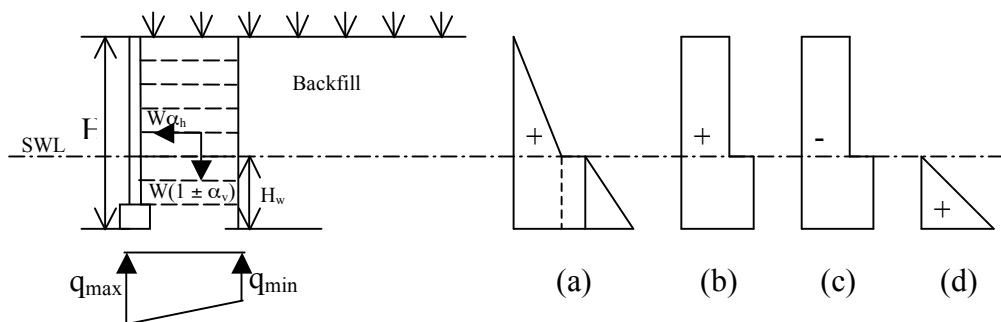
Section of reinforced earth wall (a) Earth pressure due to backfill soil (b) Earth pressure due to surcharge on the backfill (c) Earth pressure due to cohesion of the backfill soil (d) water pressure
